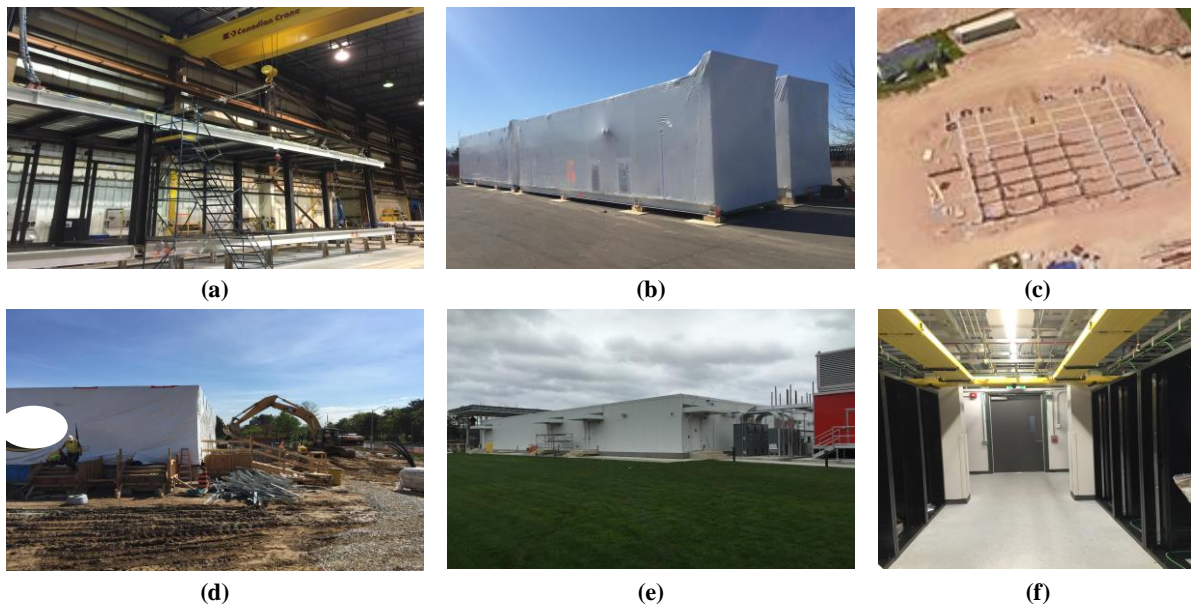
The case study at different project phases: (a) fabrication shop, (b) temporary storage area, (c) site preparation and building concrete foundations, (d) modules installation at site, (e) assembled building from outside, (f) finished building from inside.
